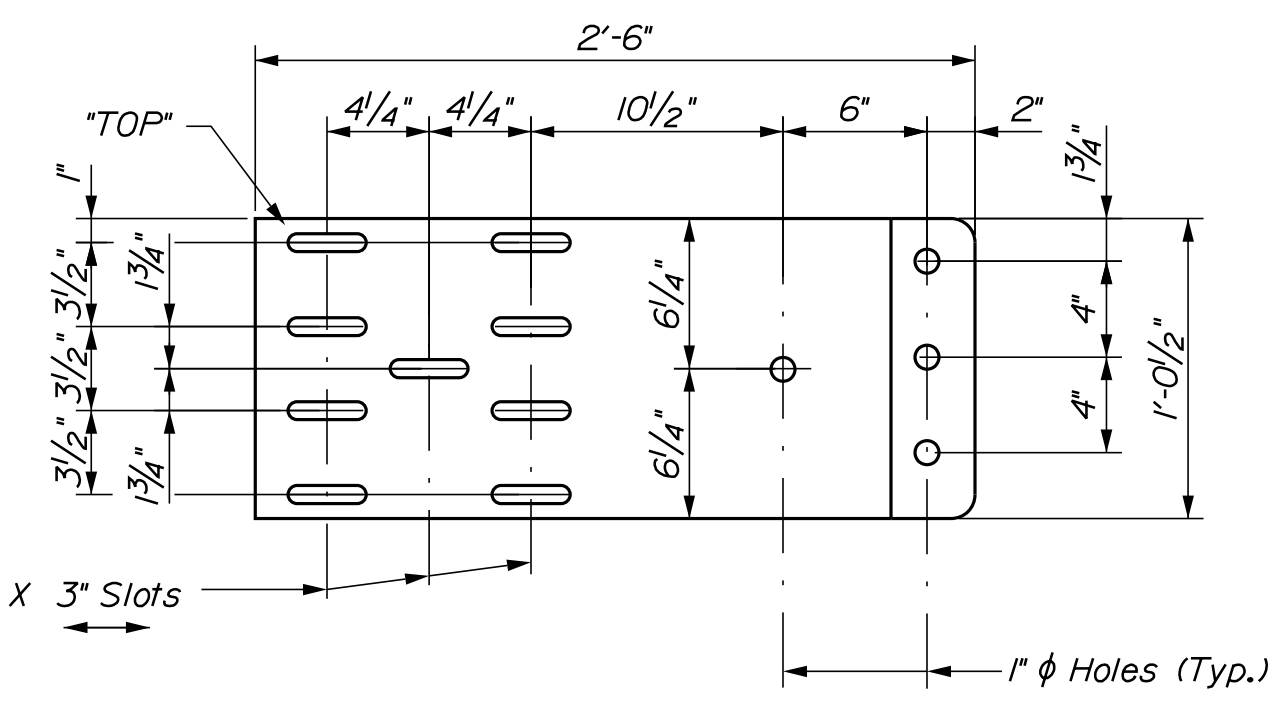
" BASE PLATE Mkd ~ pb
